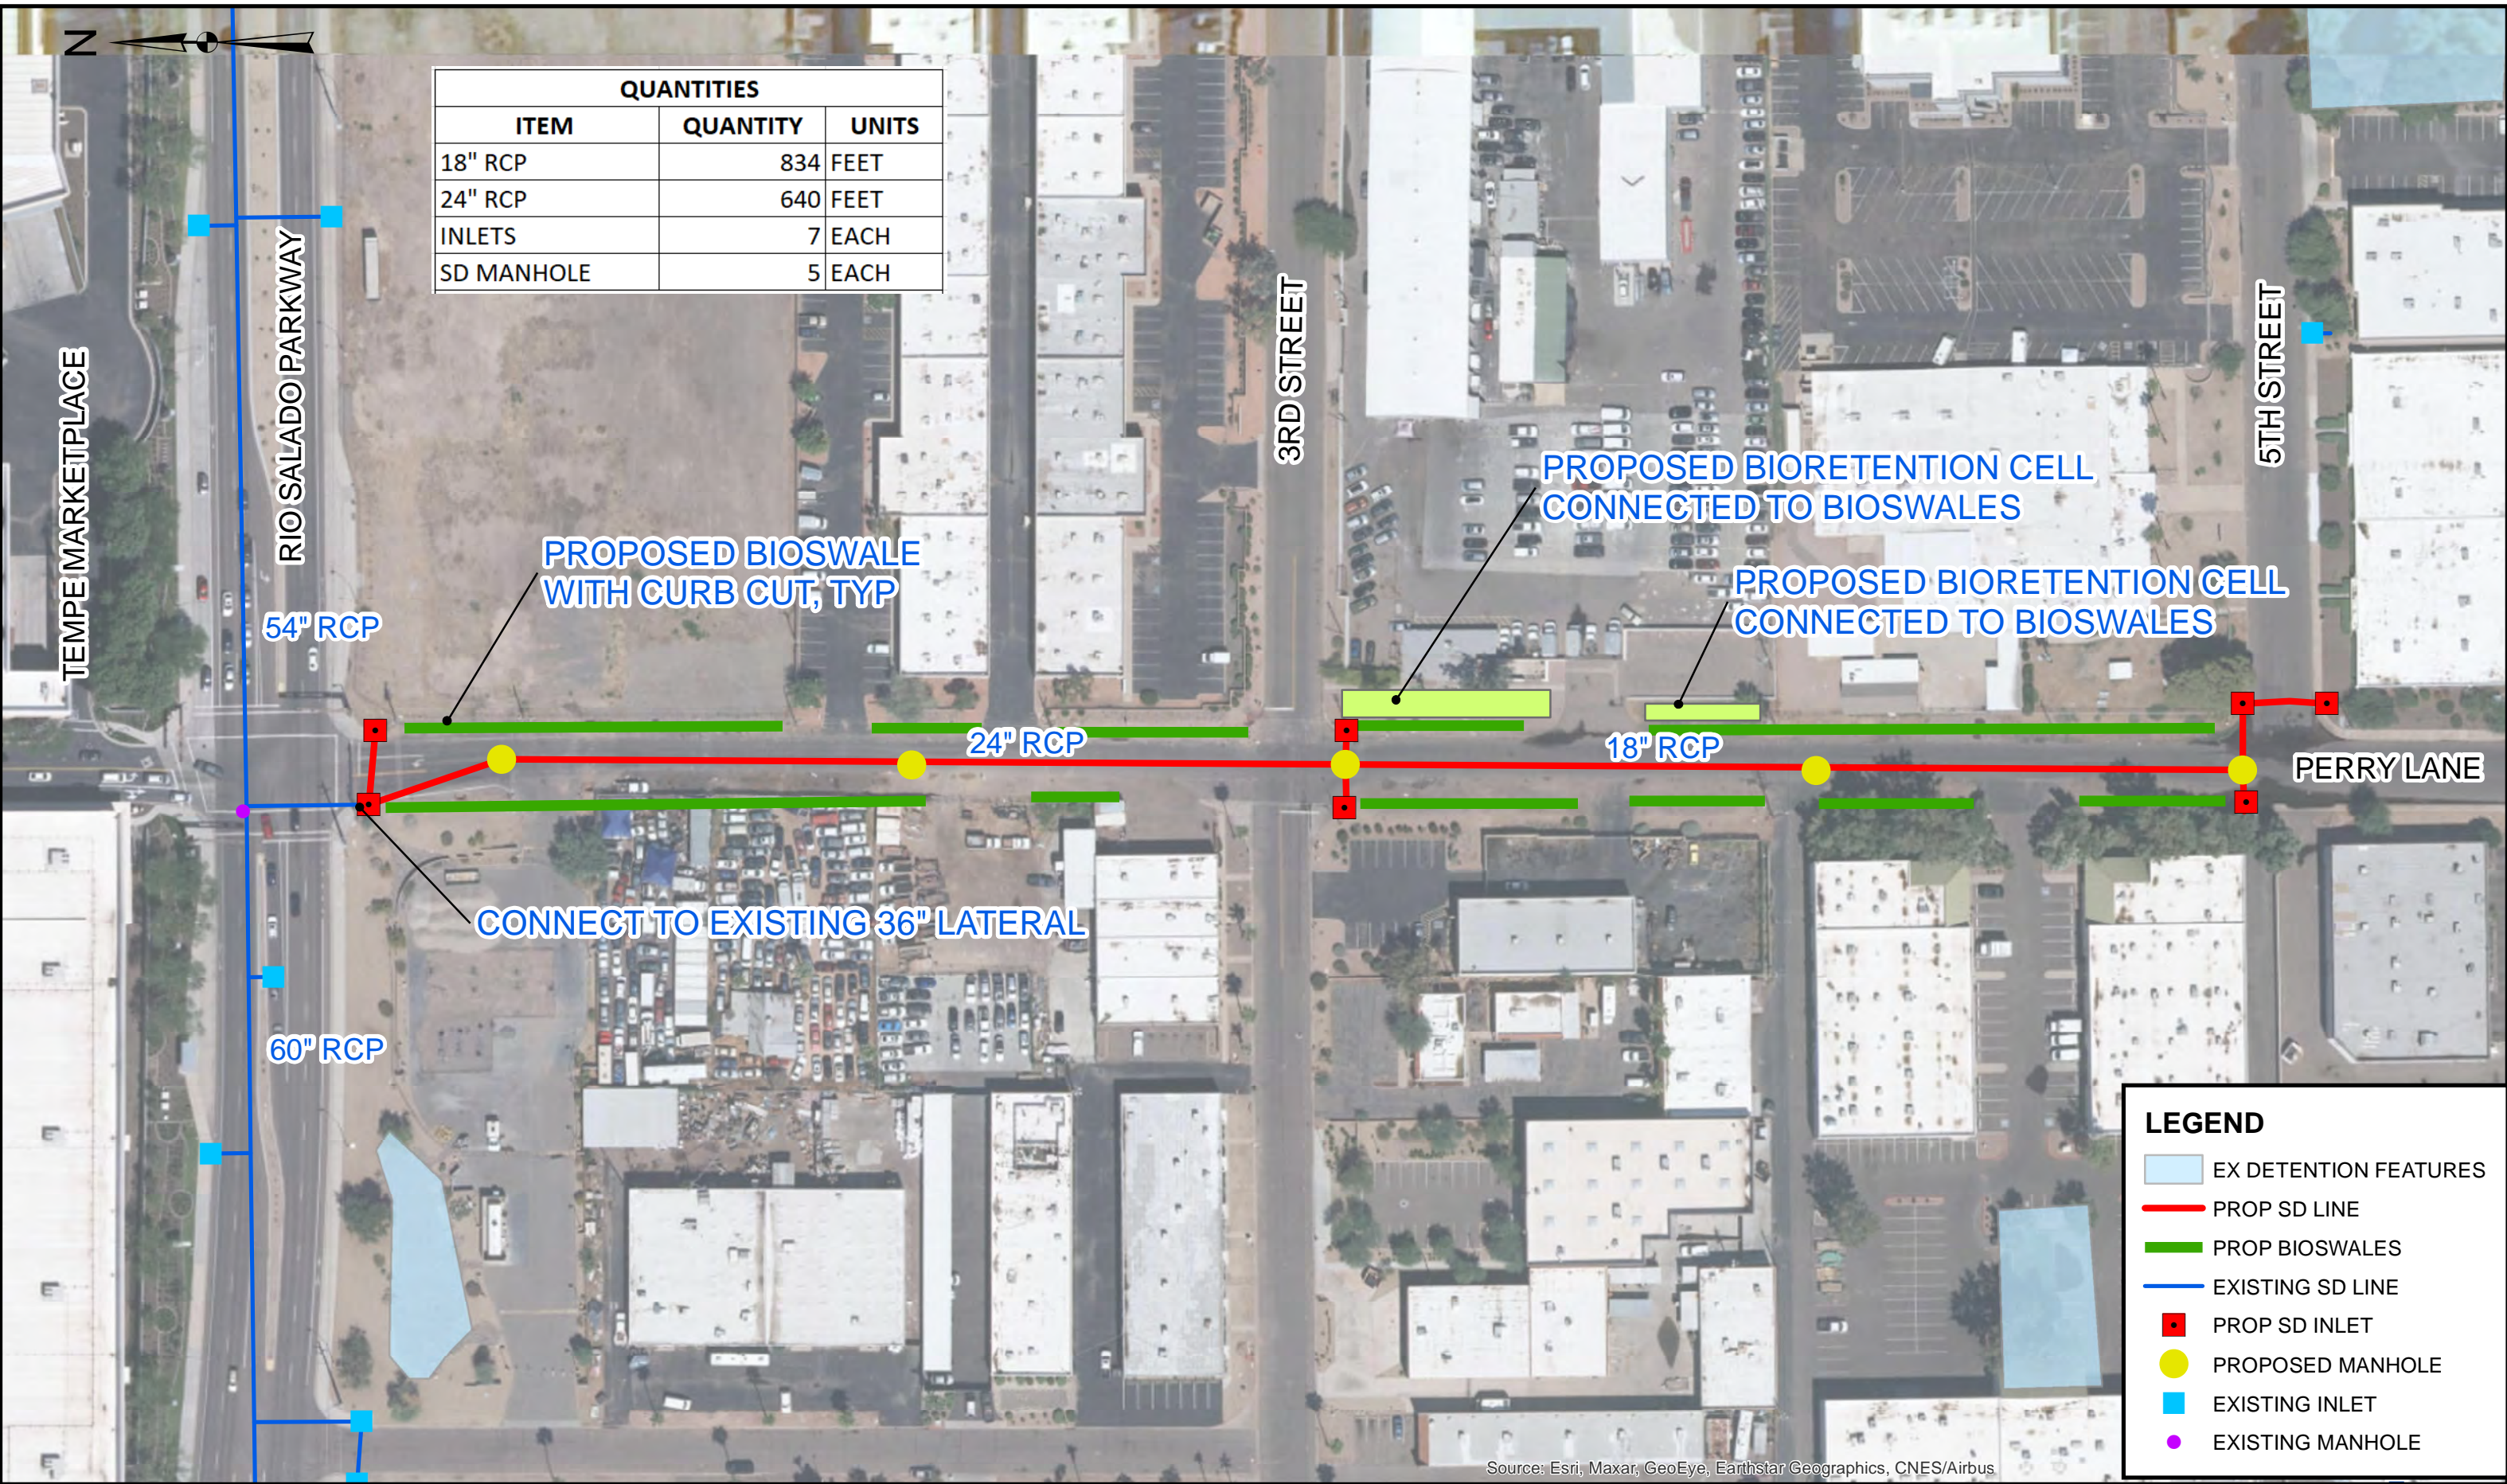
B - PROPOSED 5TH STREET DRAINAGE IMPROVEMENTS
